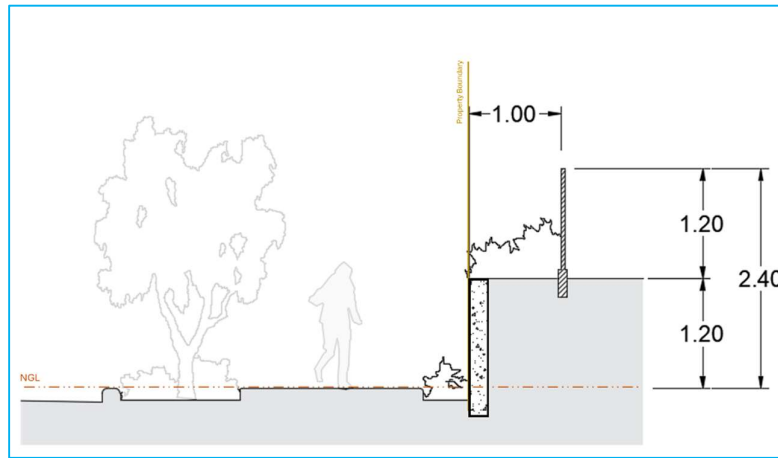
(b) b Retaining wall and fence height - one step
